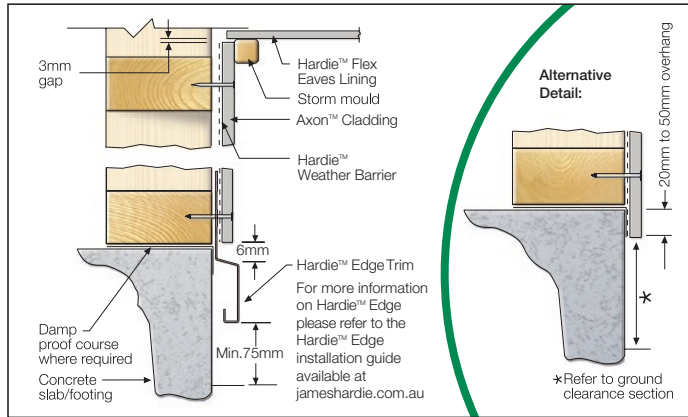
SLAB/EAVE JUNCTION DETAIL
